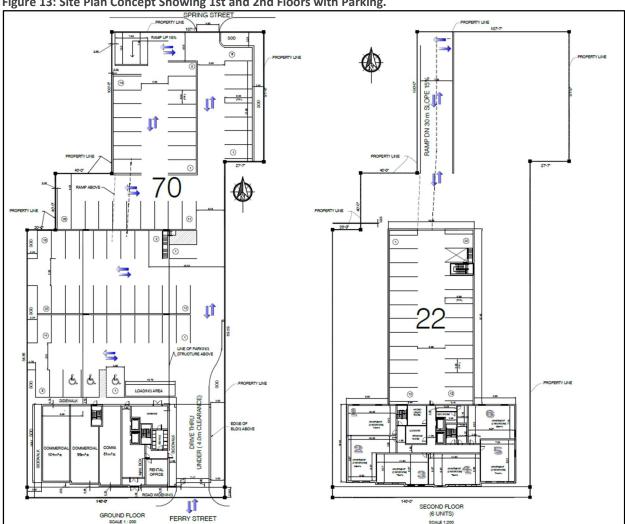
Site Plan Concept Showing 1st and 2nd Floors with Parking.
